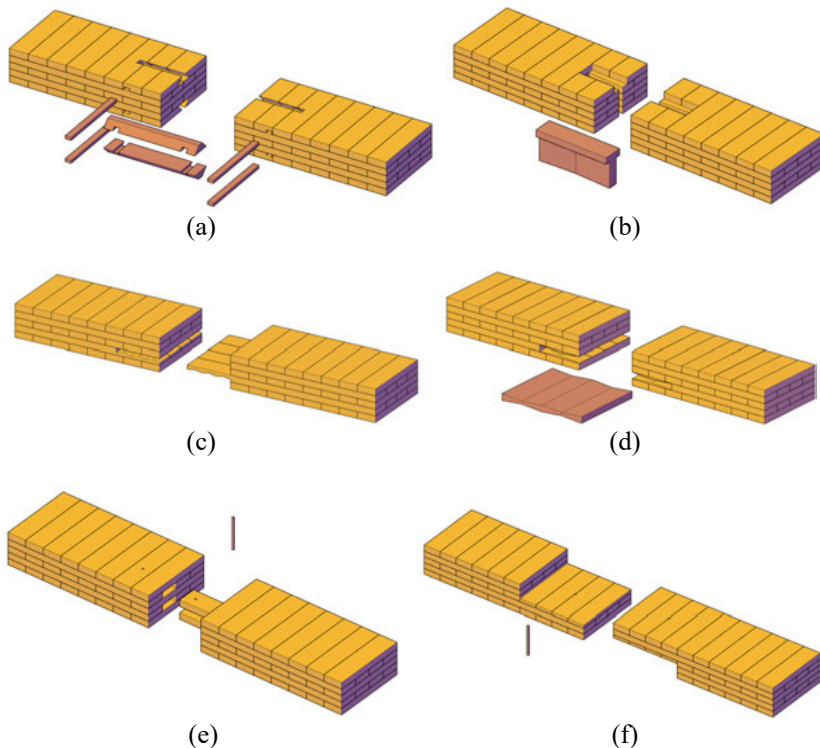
Six timber connections on 5-ply CLT panel, (a) AF Timber connection 1 – BC connection, (b) AF Timber connection 2 – TS connection, (c) AF Timber connection 3 – GT connection, (d) AF Timber connection 4 – GC connection, (e) AF Timber connection 5 – DS connection, and (f) AF Timber connection 6 – HL connection.
